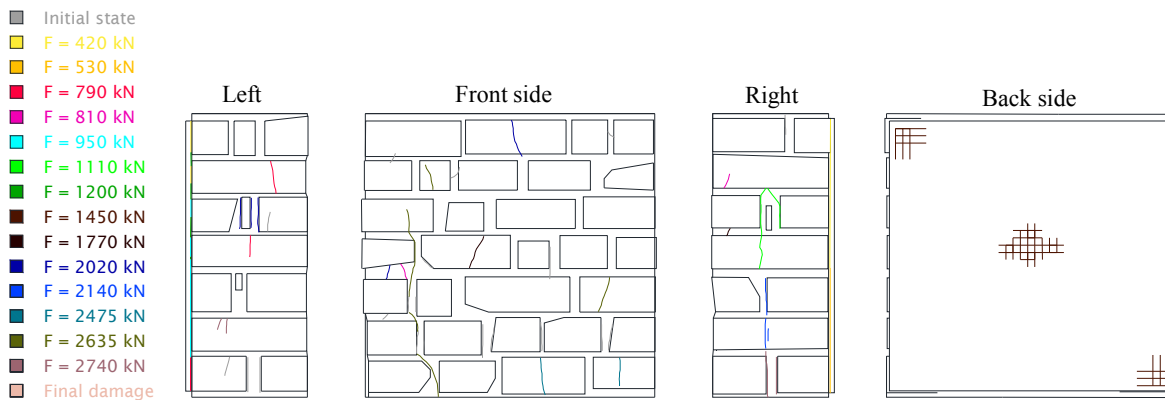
Crack pattern development on the wallette with header stones and on the plaster at test TP-1
